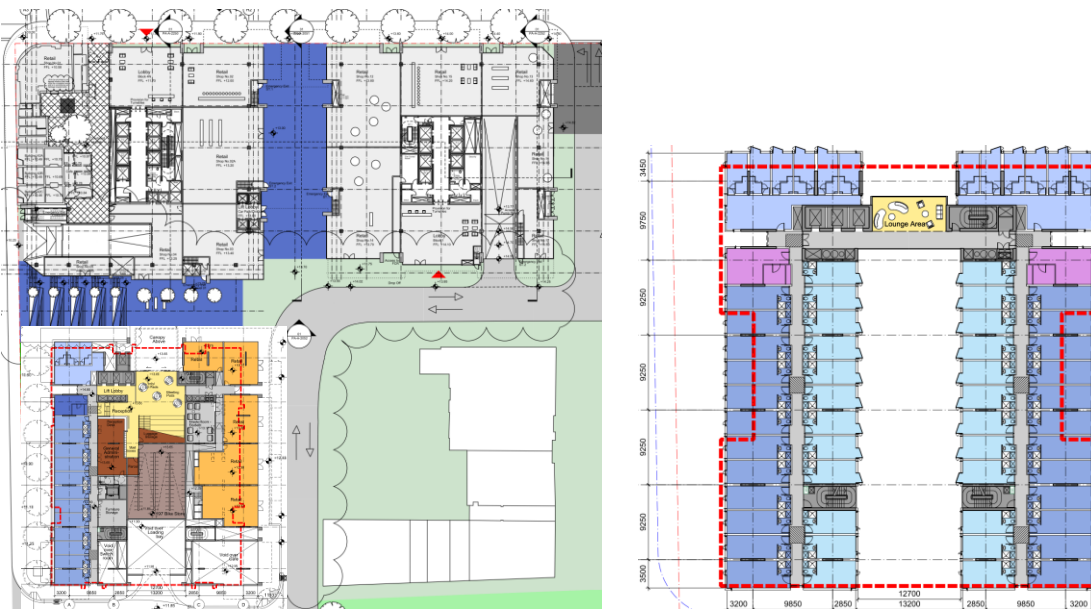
Ground floor plan of Blocks 1&4 (L) and Level 5 plan of Block 4S (R)
